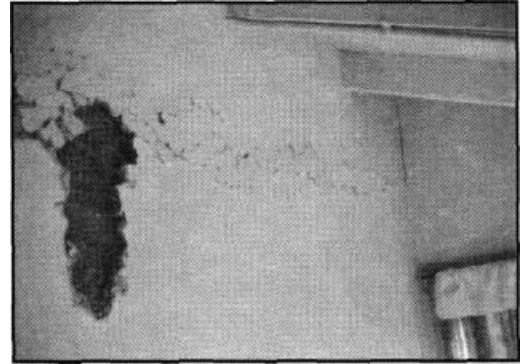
Horizontal cracking at the bottom of the bond beam, Lopez Adobe.
